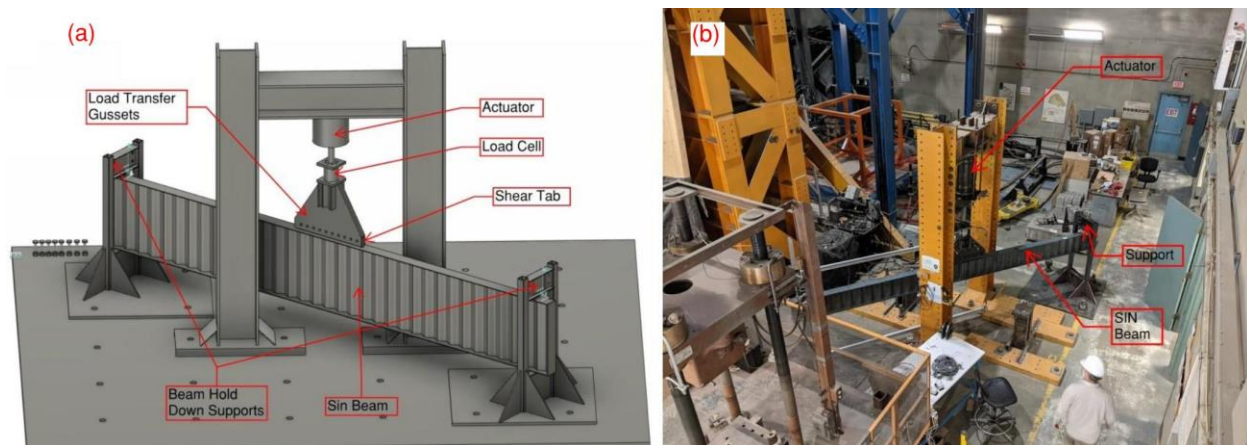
Testing Apparatus (a) 3D Rendering (b) Constructed Setup
